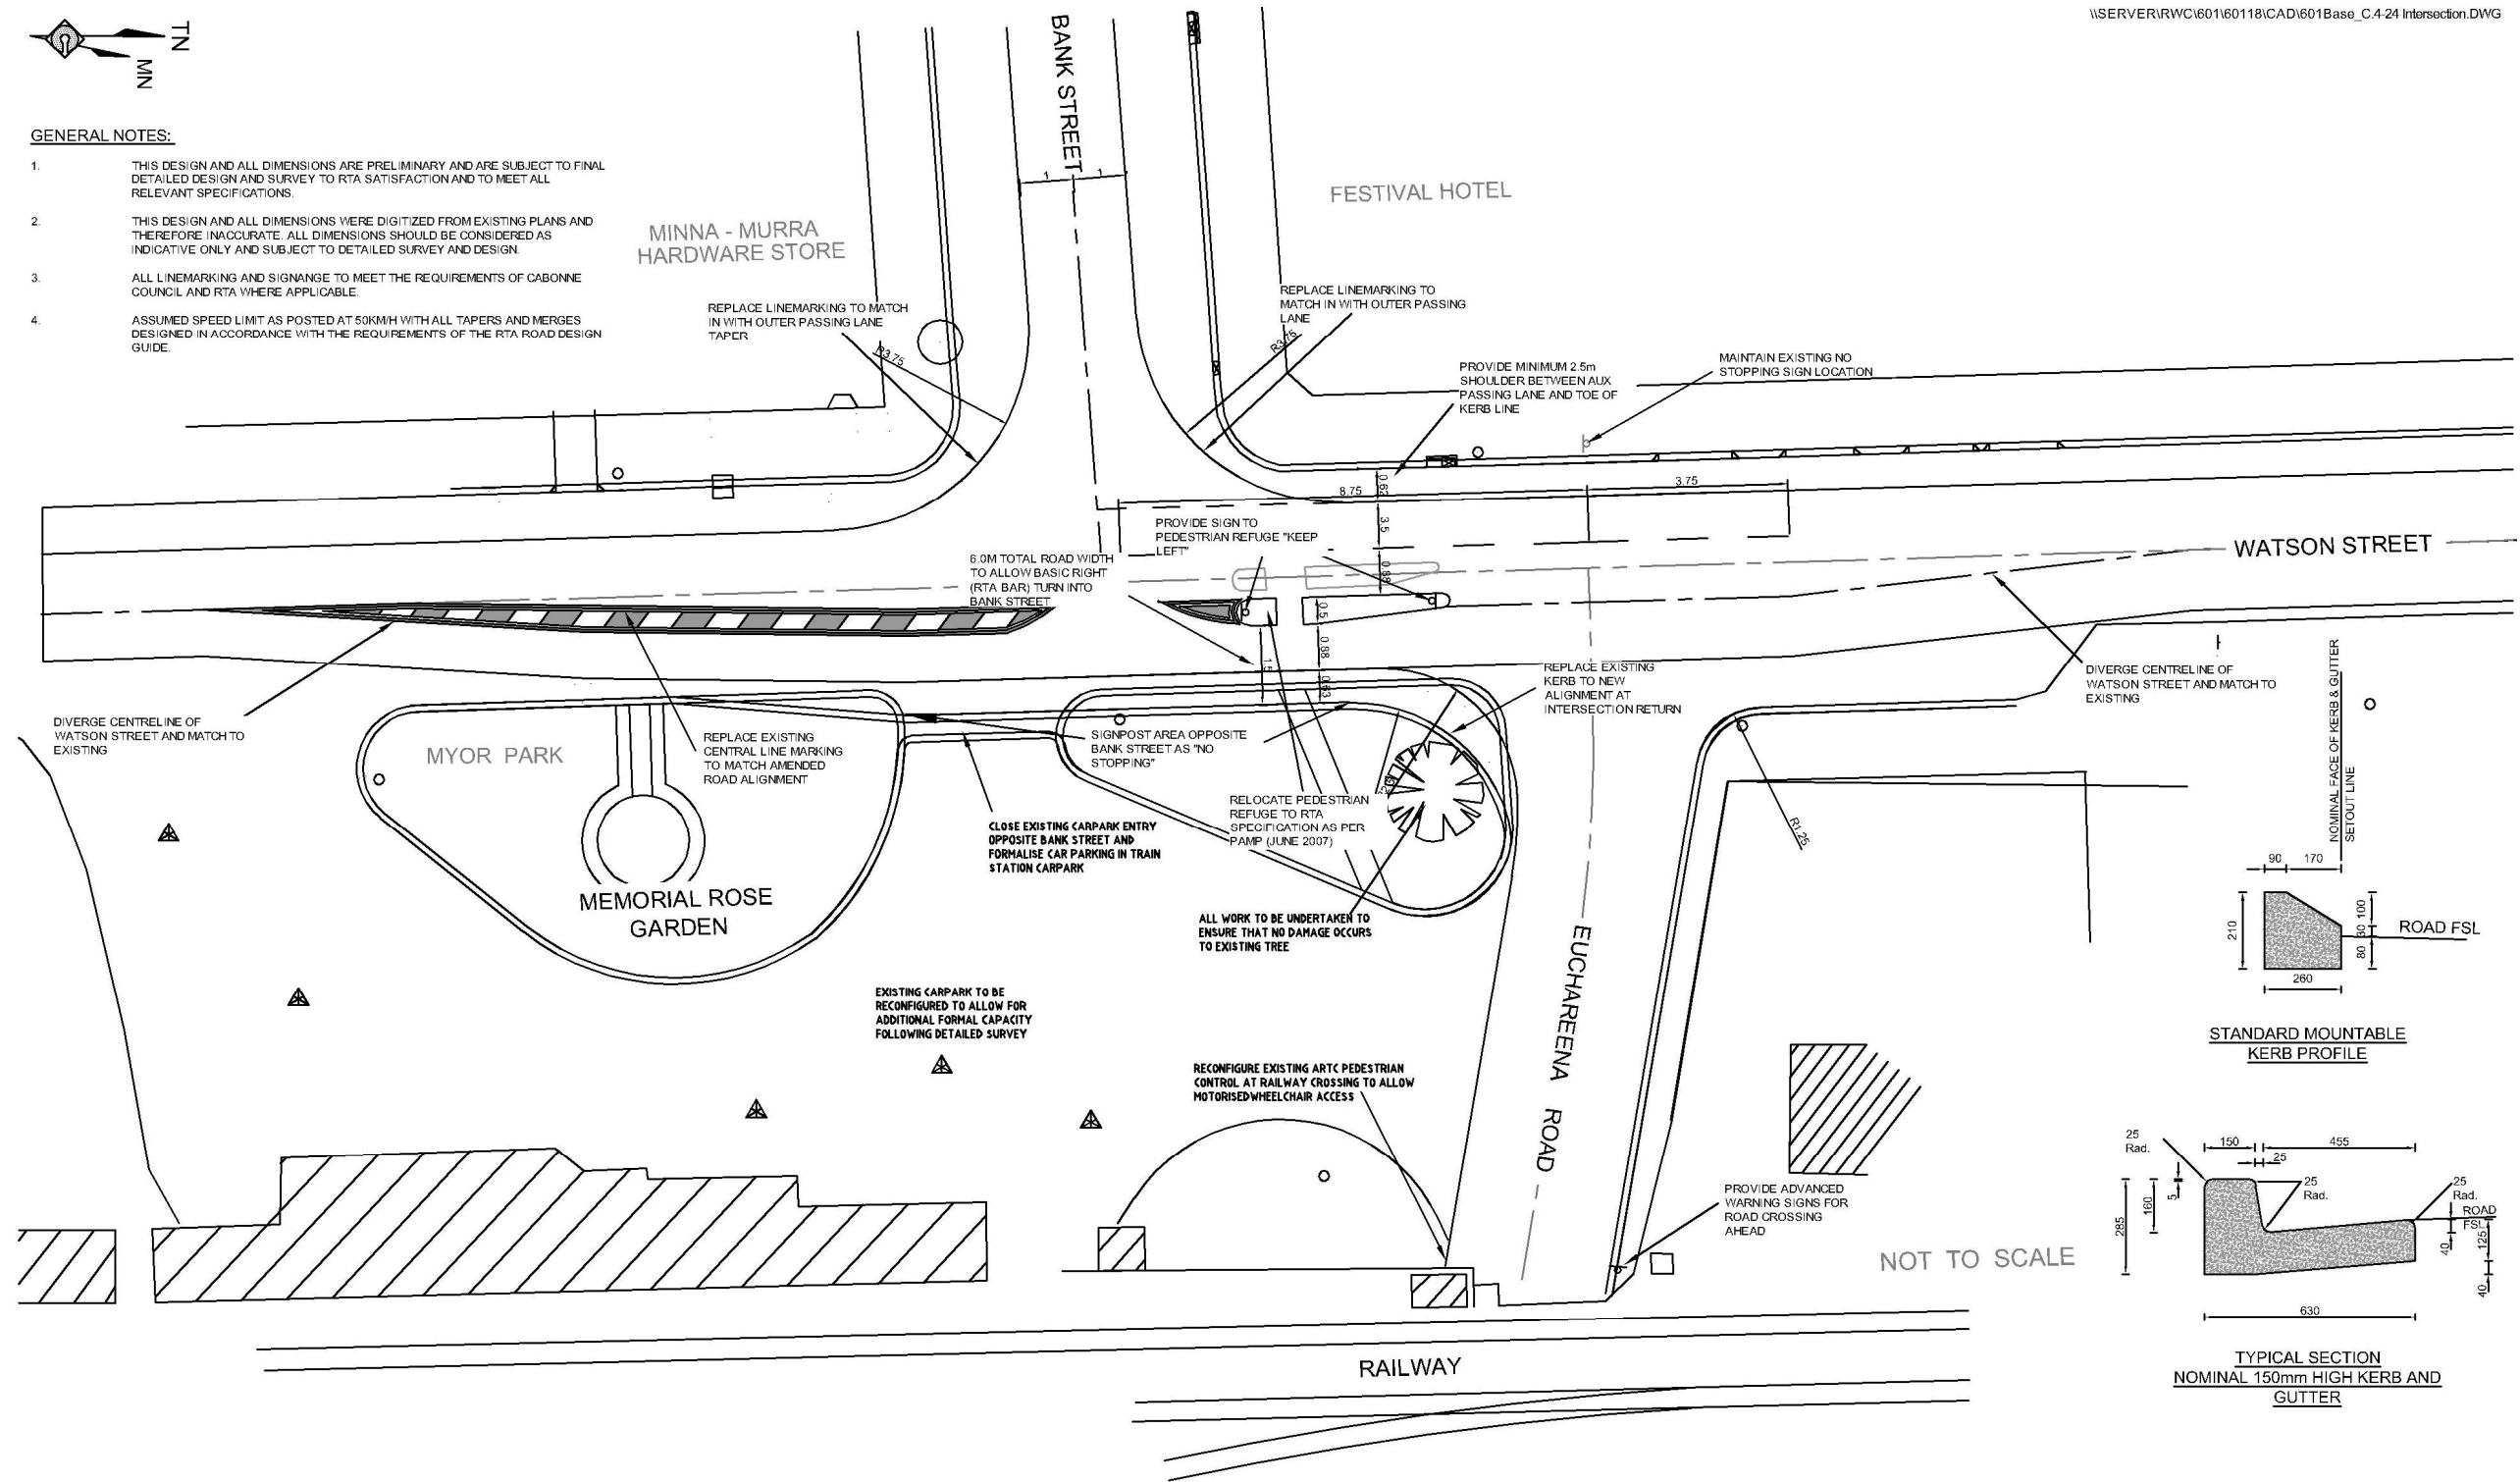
Proposed intersection to the Euchareena Road Site
